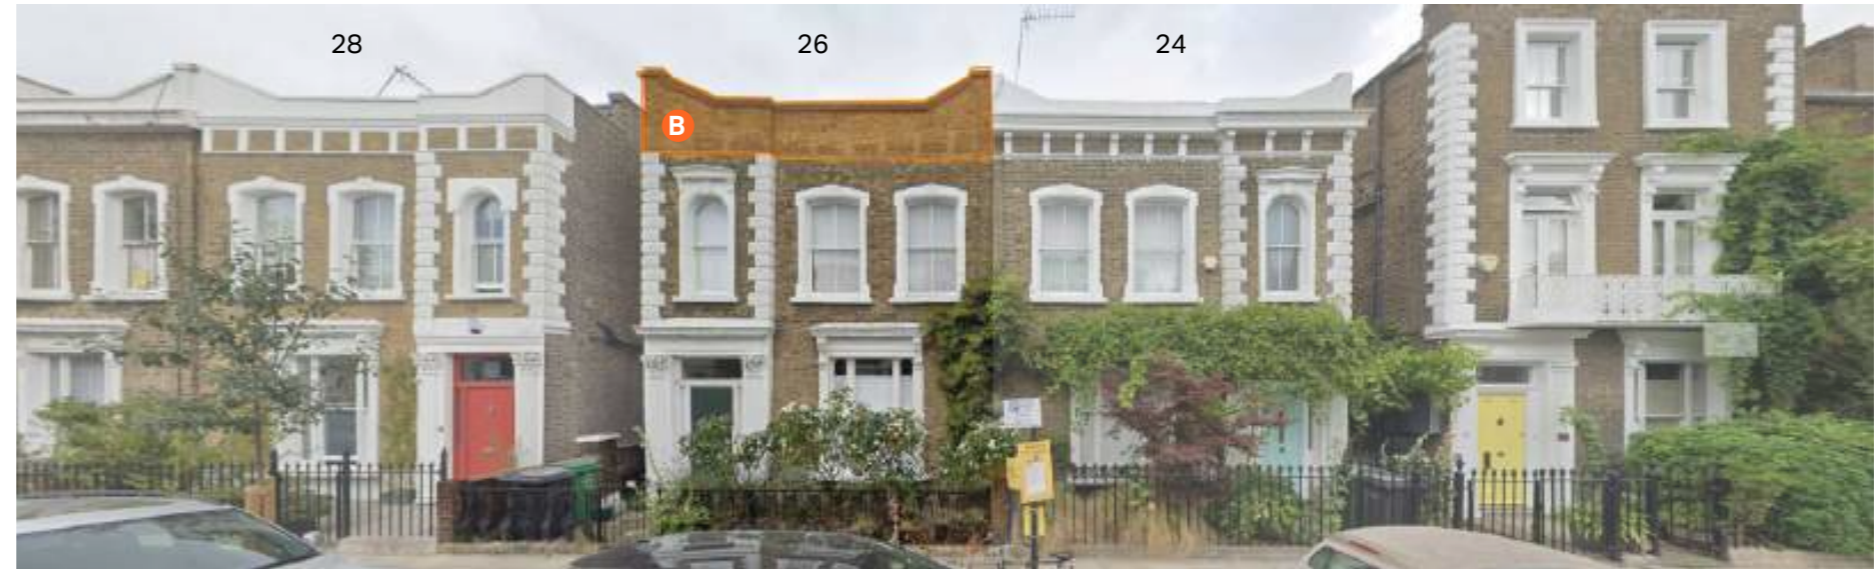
Street View highlighting lost plasterwork at roof level of no.26
